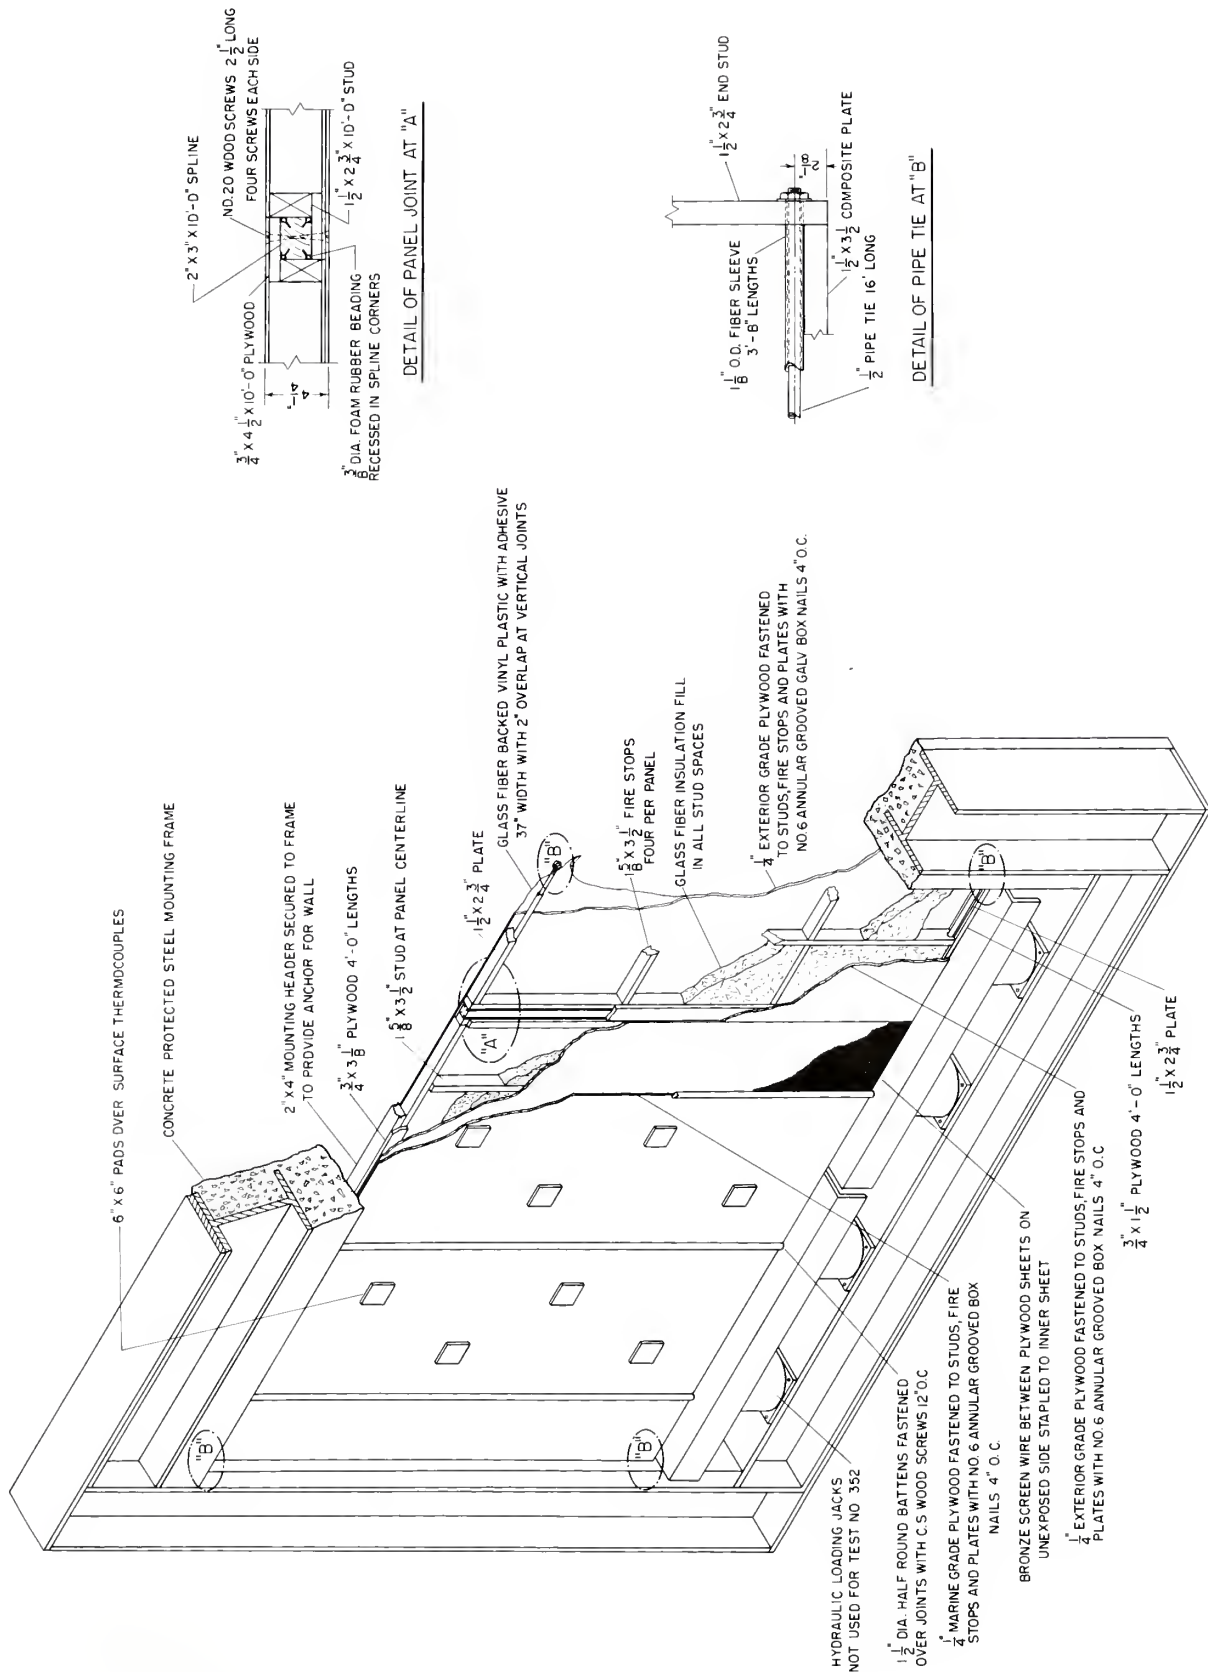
CONSTRUCTION AND MOUNTING DETAILS OF PREFABRICATED WOODEN EXTERIOR WALL
